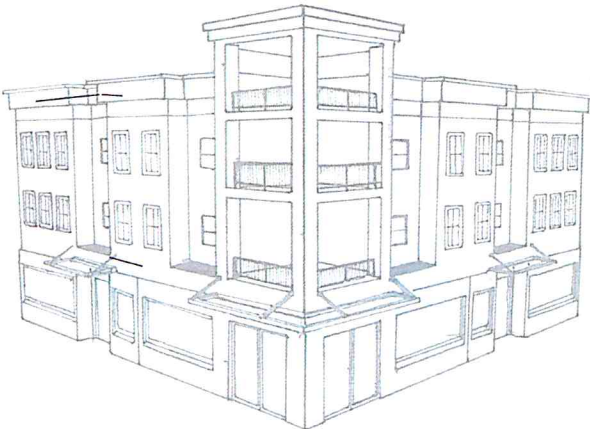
(Corner Buildings): When a structure is sited on a corner parcel the structure must wrap the corner by continuing all primary façade elements. The image above indicates how a corner building might wrap the transparency, façade articulation and entrance requirements of the structure.
